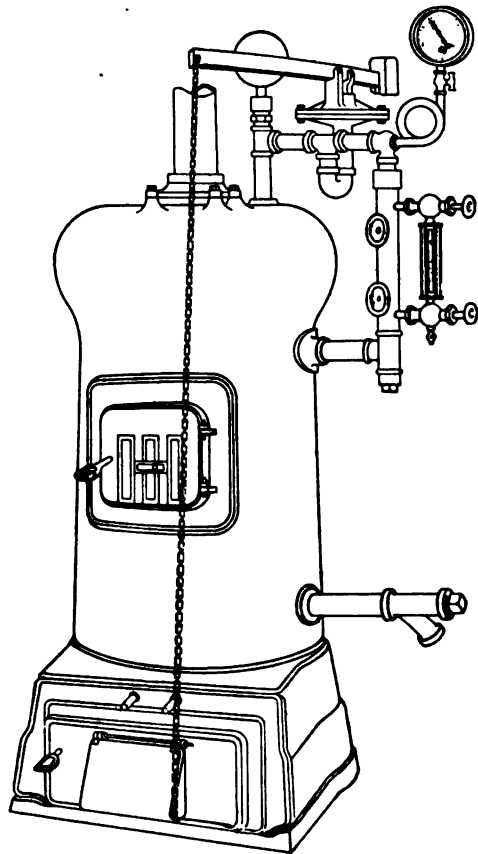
Small Low-Pressure Steam Heating Boiler.
